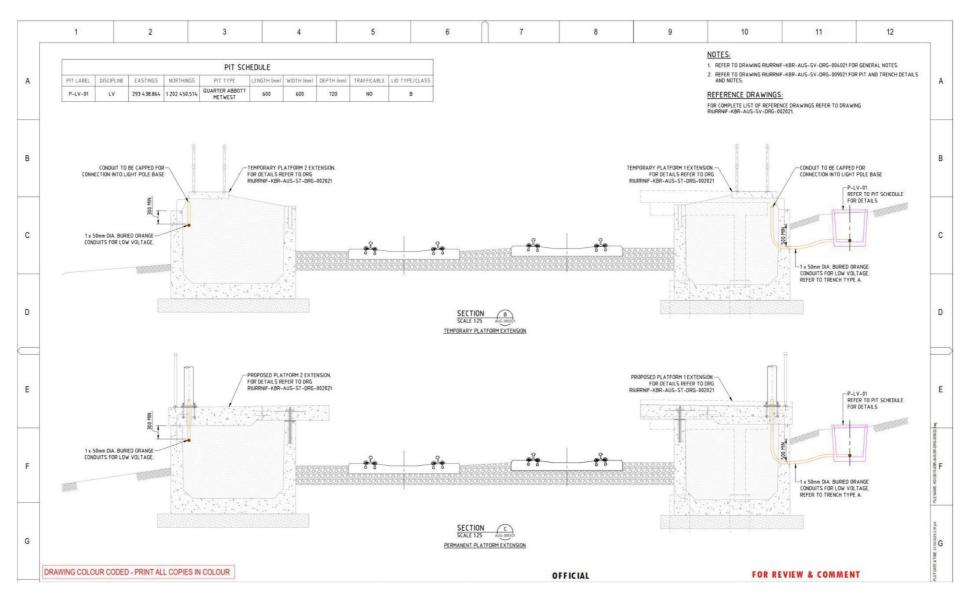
Section plan of the proposed Austinmer Station platform extension services routes (Source: Transport for Tomorrow 2025)
